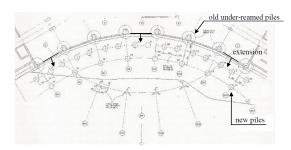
Existing and new foundation plan for the Empress State Building *[Giannopoulos, 2011]
